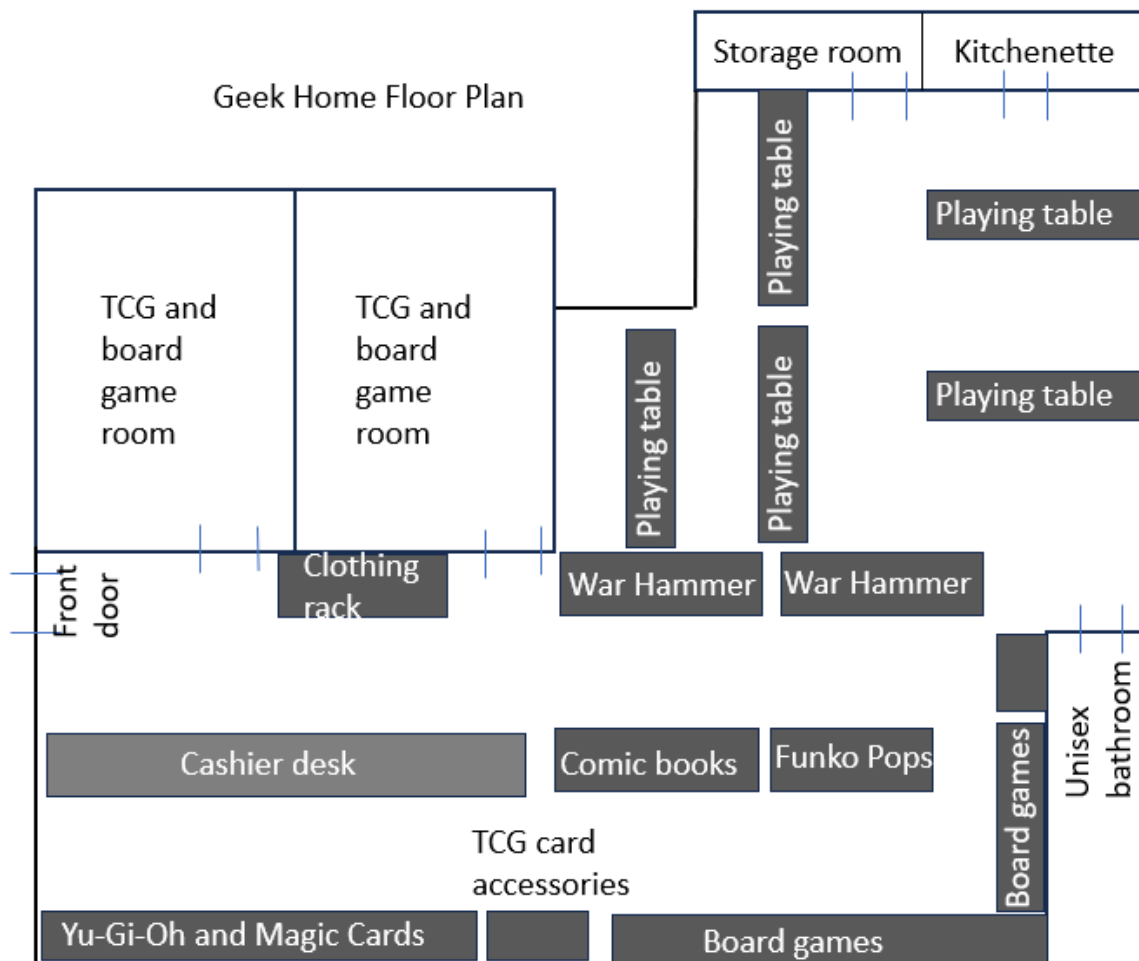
Floor plan of The Geek Home (Vahed, 2024)
